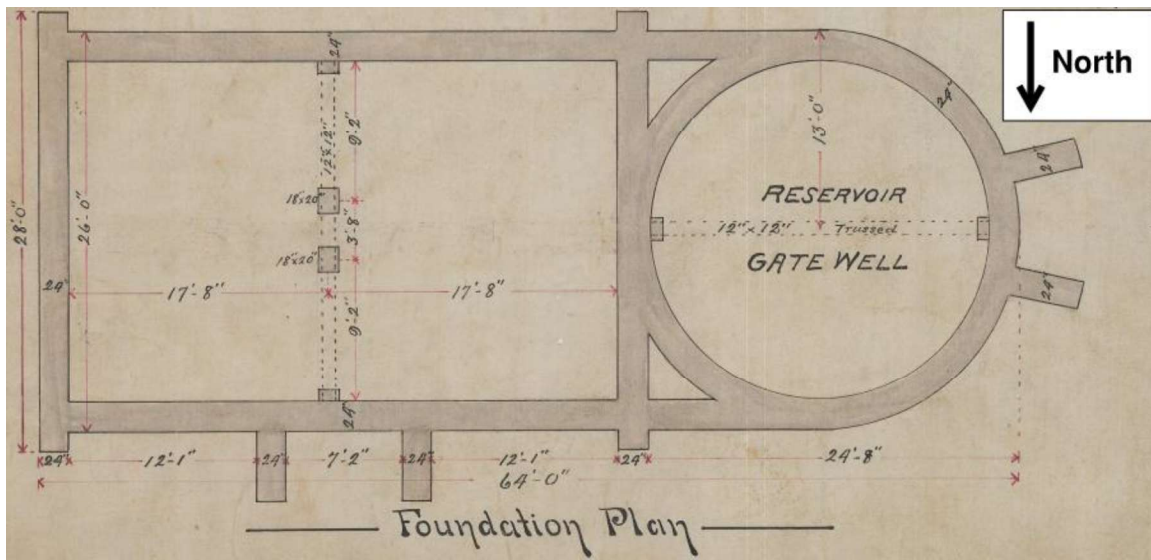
Reservoir 2 Gate House Foundation Plan
